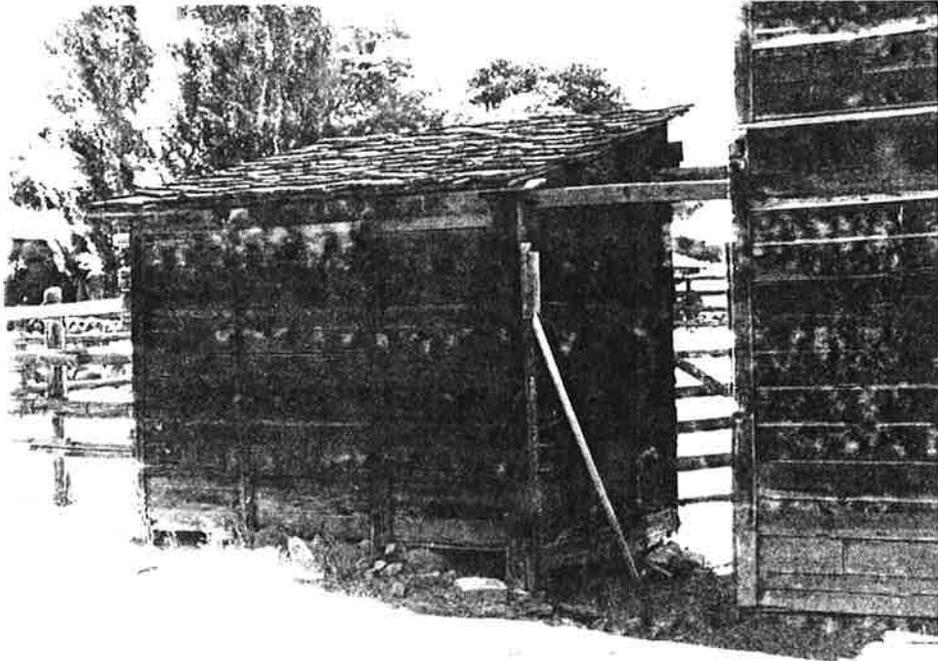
Birch Creek tack room building, east and north elevations. Note the 2x4s attached between the building and the barn to the right added as a temporary stabilization measure. The March 1993 flood deposited debris underneath this building. (Neg. R2-1)
